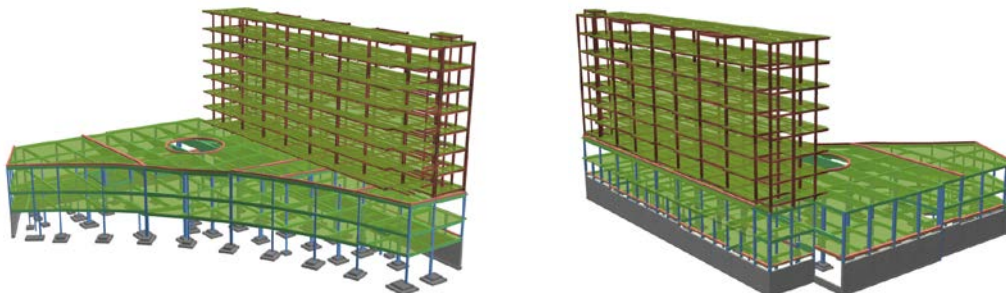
Model presenting the existing RC frame structure and its steel structure extension.
